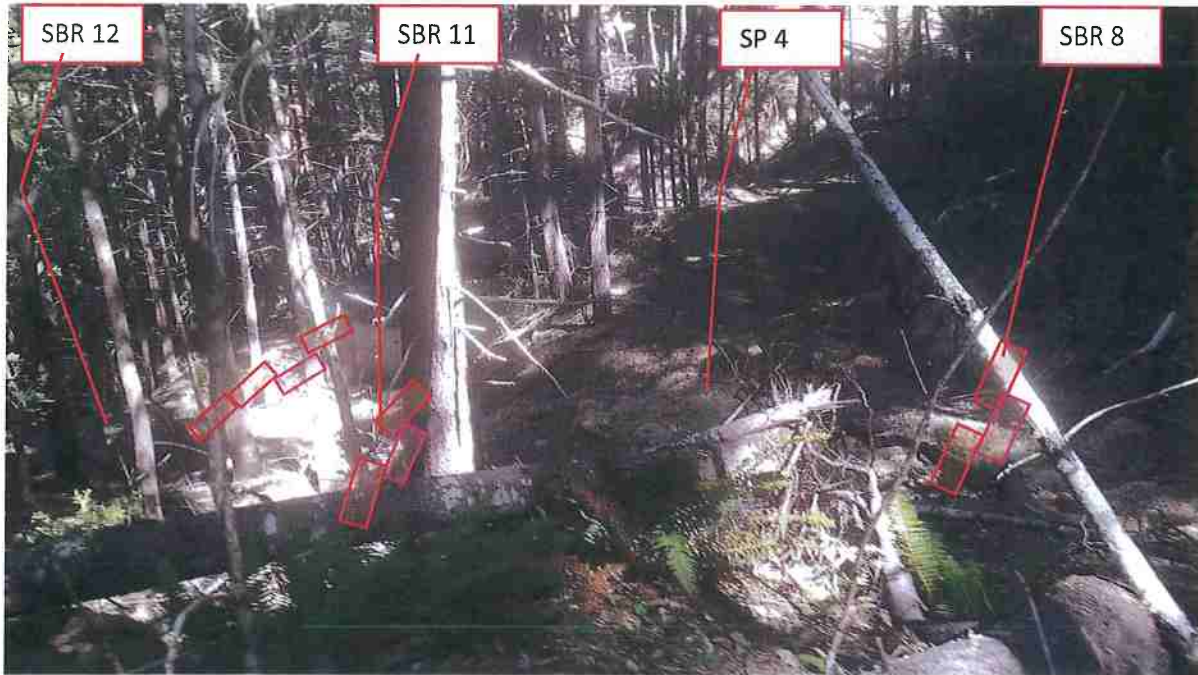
Photograph showing where the access road exits the drainage below the impoundment structure toward the east leaving drainage 1 and heading toward drainage 2. The drainage flow path flows to the west side of a structure that is situated on an old logging road (see Site Map, Building 2). The red rectangles above show the proposed placement locations of proposed straw bale rows SBR 8, 11 & 12 along with soil pile SP 4. The proposed straw bale rows will be used to collect potential transported sediment and act as velocity dissipation. Soil pile SP 4 consists of approximately 5 yards of soil that spans 60 square feet that was placed as the access roads fill in order to make the turn out of the stream channel.
